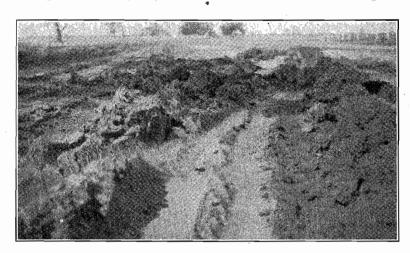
Showing damage on Main Road, between Minyip and Warracknabeal, caused by excessive loads.
